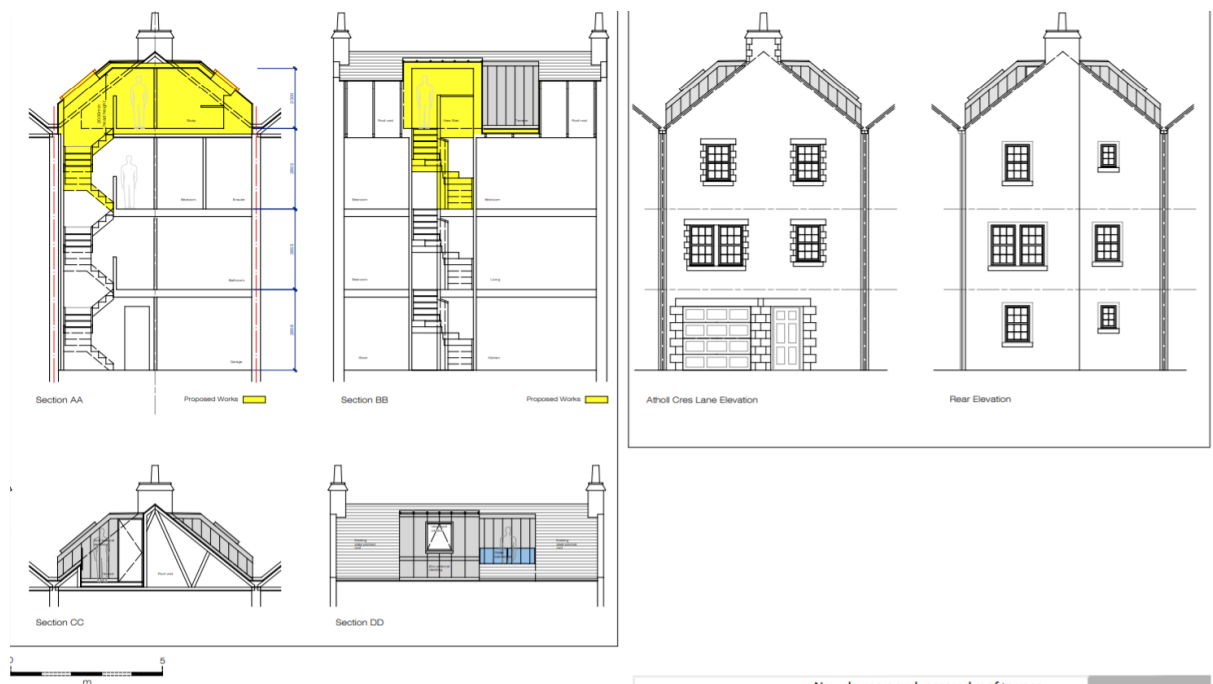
above: Approved Elevations of planning consent LPA ref: 20/02782/FUL.
